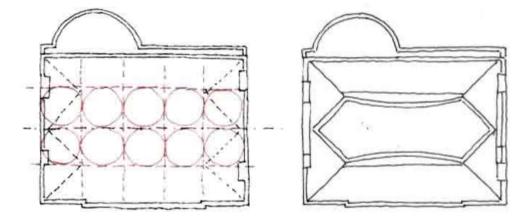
Third floor plan showing proportion system Fig 97: Roof plan showing scallop forms
